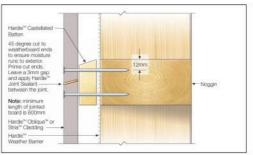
VERTICAL BUTT JOINT DETAIL
